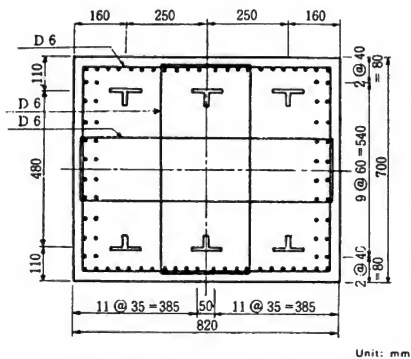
Section of the Columns of No. 5 (SRC-Without Stud) and No. 6 (SRC-With Stud) Models
